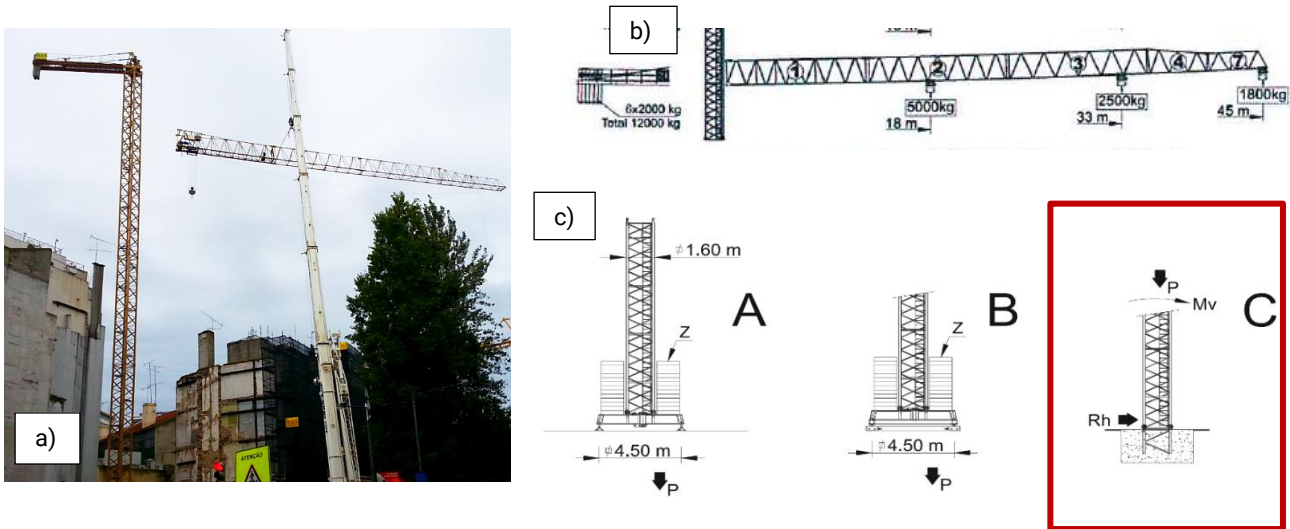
| a) Tower crane being assembled; b) Admissible loads in the boom and counter boom; c) Types of foundations and foundation used.
